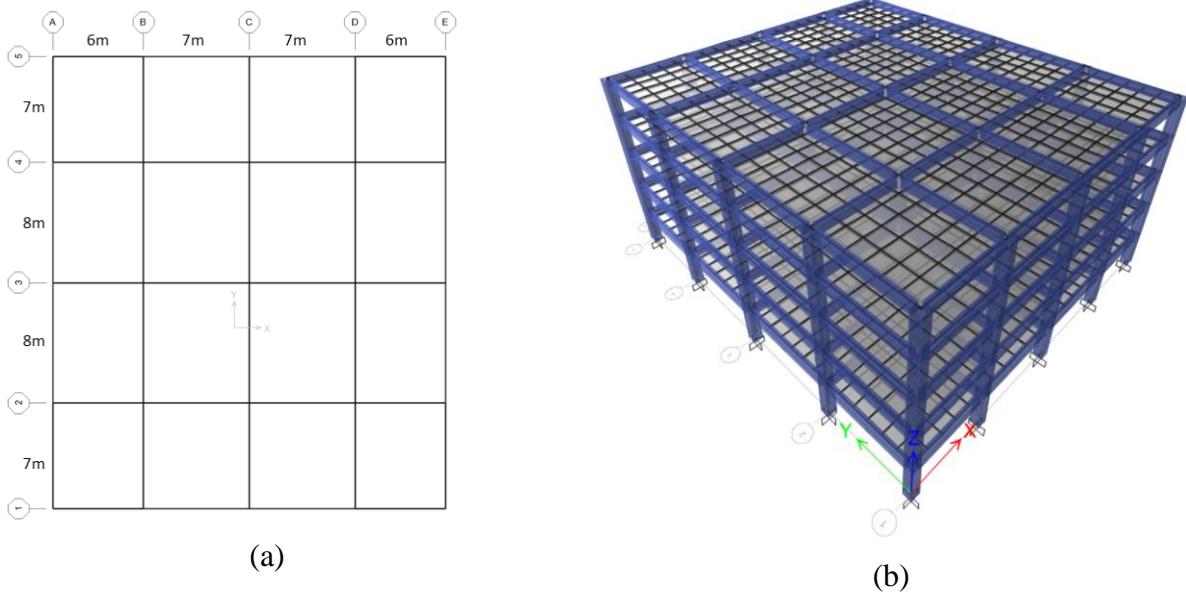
Archetype of a five-story four-bay RC frame building; (a) typical plan view and (b) 3-D model
